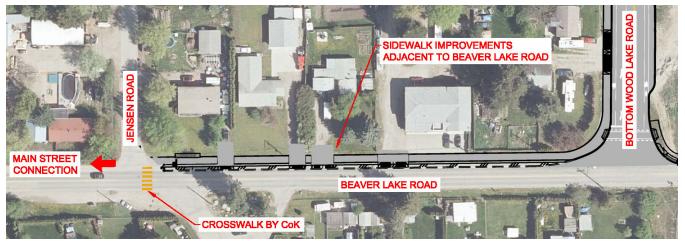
Plan showing proposed pedestrian improvements adjacent to Beaver Lake Road
